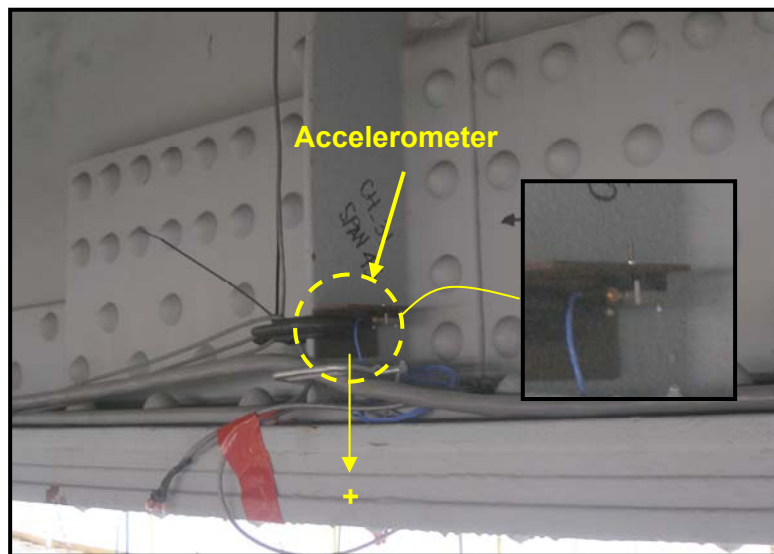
Accelerometer CH_31 installed in Span 45 at midspan of the east girder
